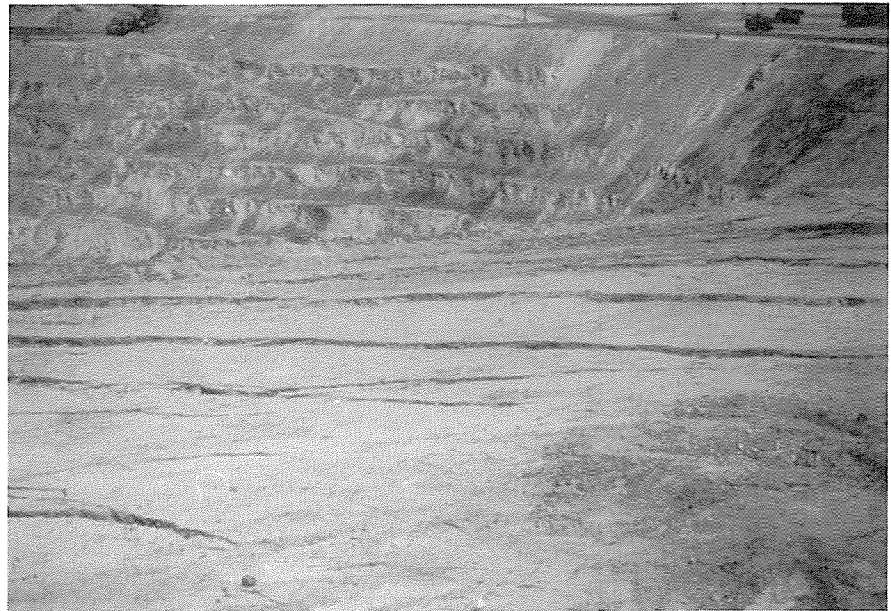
The multiple cracks in the west side haul road at the Lornex Mine indicate a major toppling failure. The cracks have occurred along parallel clay-filled shear zones dipping at 55° - 70° into the slope. For a future setback, horizontal drainage should be installed near the crest and continued about every 100 feet in depth.
